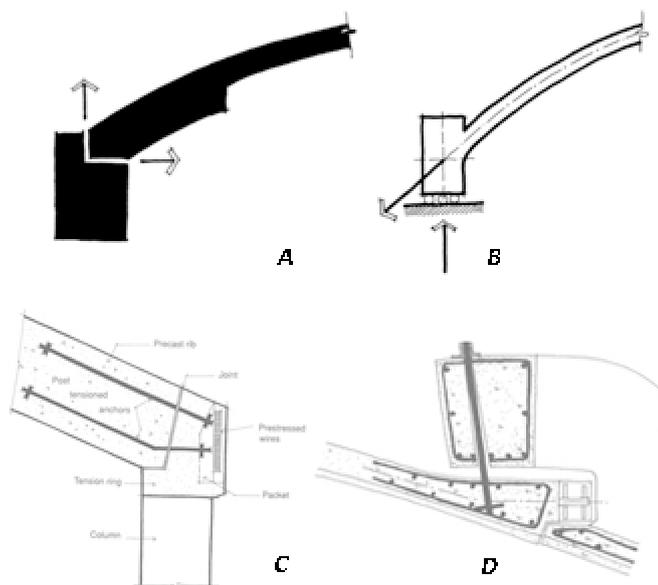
16 Typical supporting details in concrete shell constructions (Melaragno, 1991)
